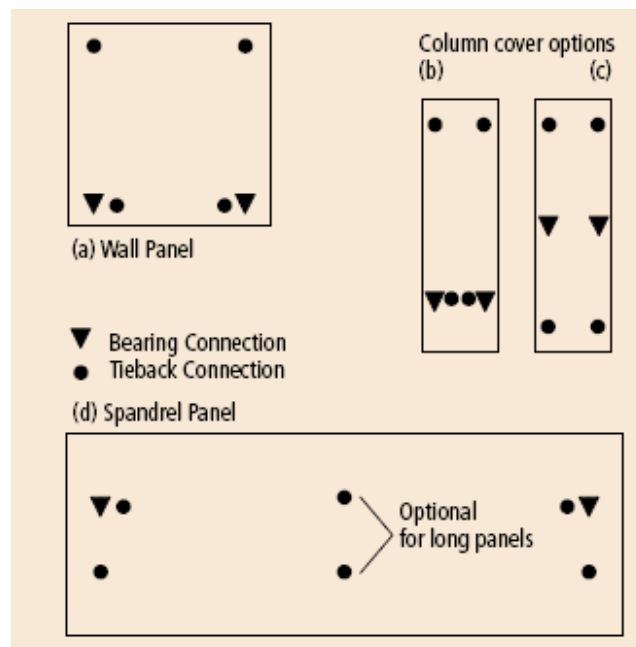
Typical panel configurations (from Precast/Prestressed 2007, by permission)
